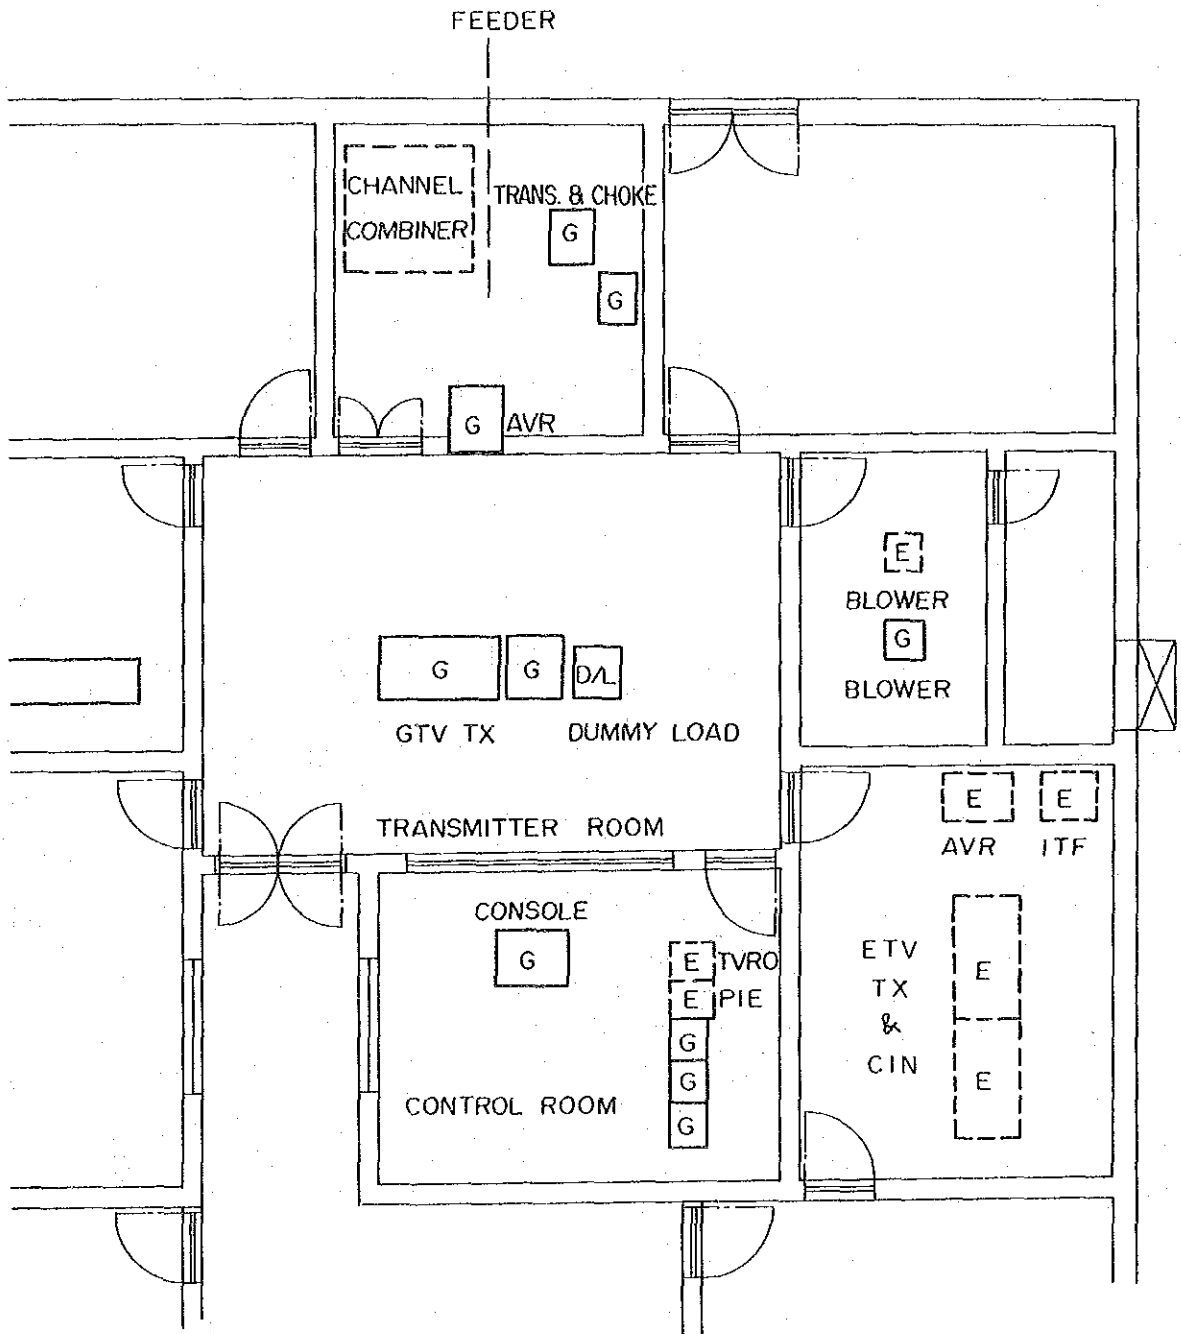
EQUIPMENT LAYOUT OF RBS PASRUR
